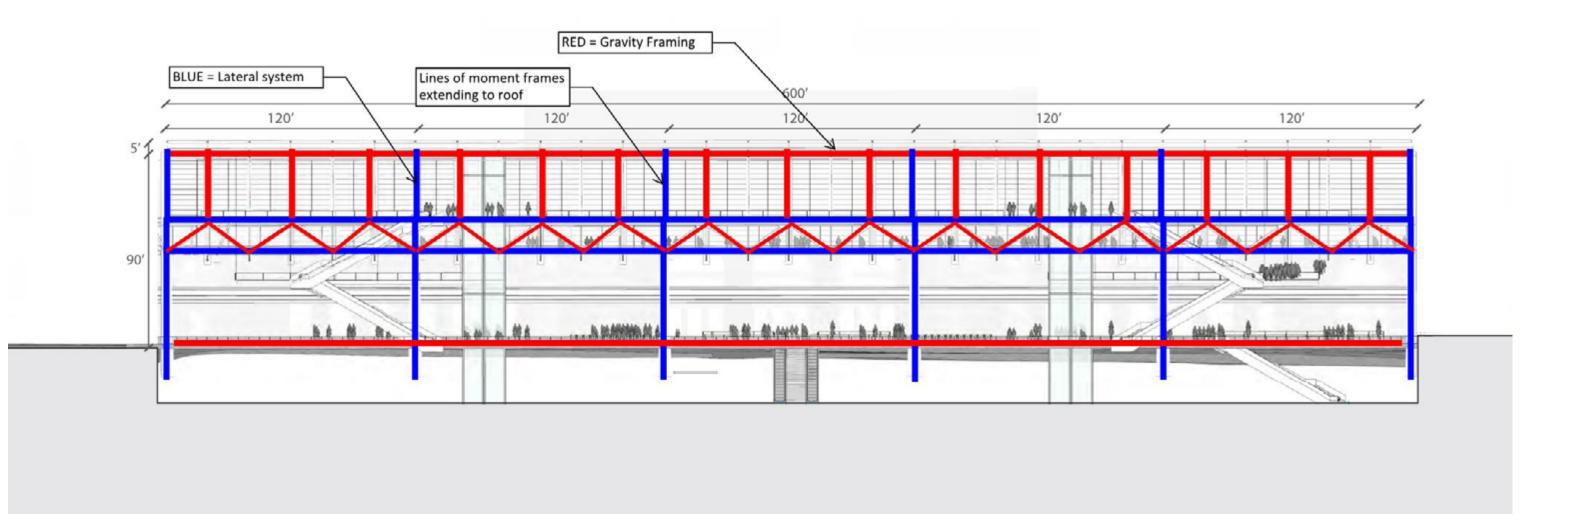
Bus on South with Mezzanine Level Structural Elevation
